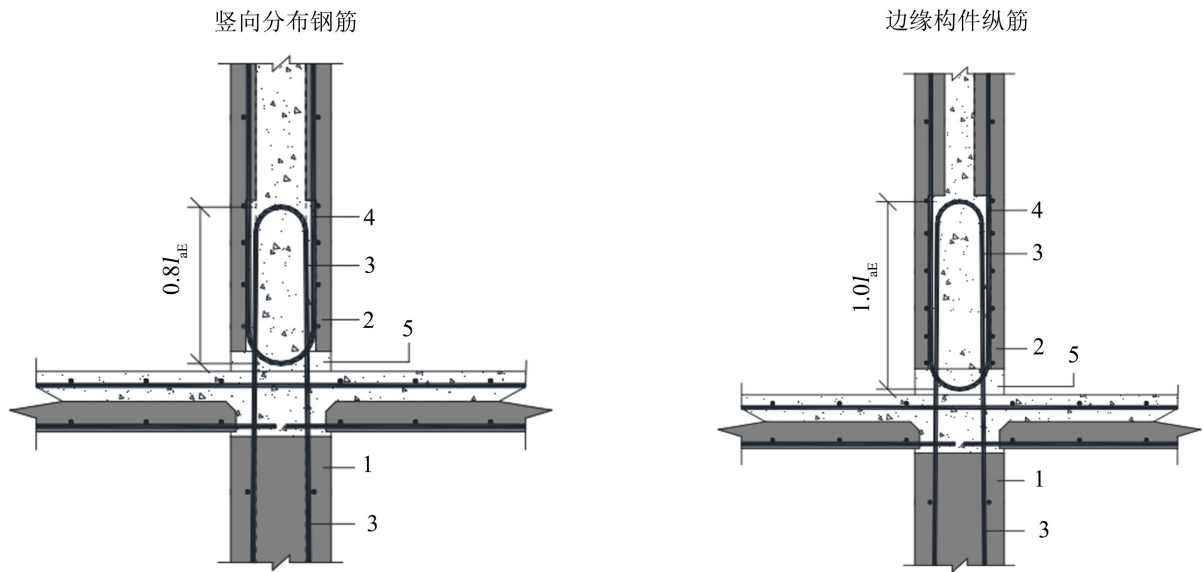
Schematic diagram of typical joint connection of longitudinal rib system [7]
